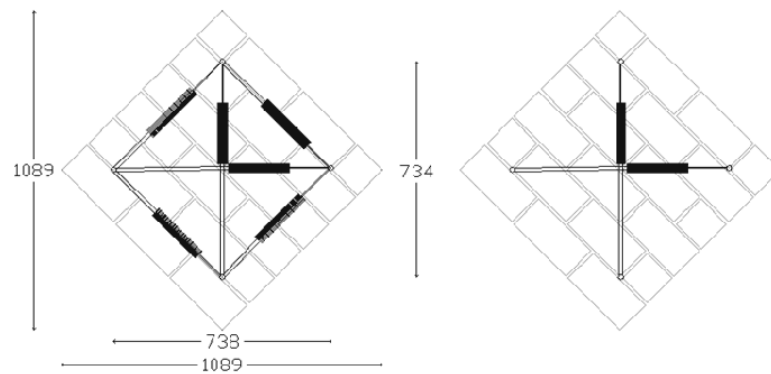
half-full brick panels layout of sensors on the wall compressed diagonally [mm]
